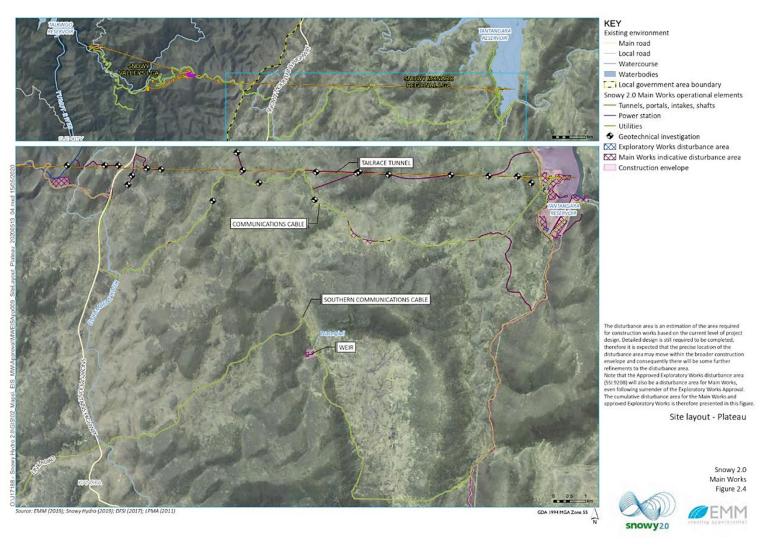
Construction areas – Plateau (Infrastructure Approval Appendix 2)
